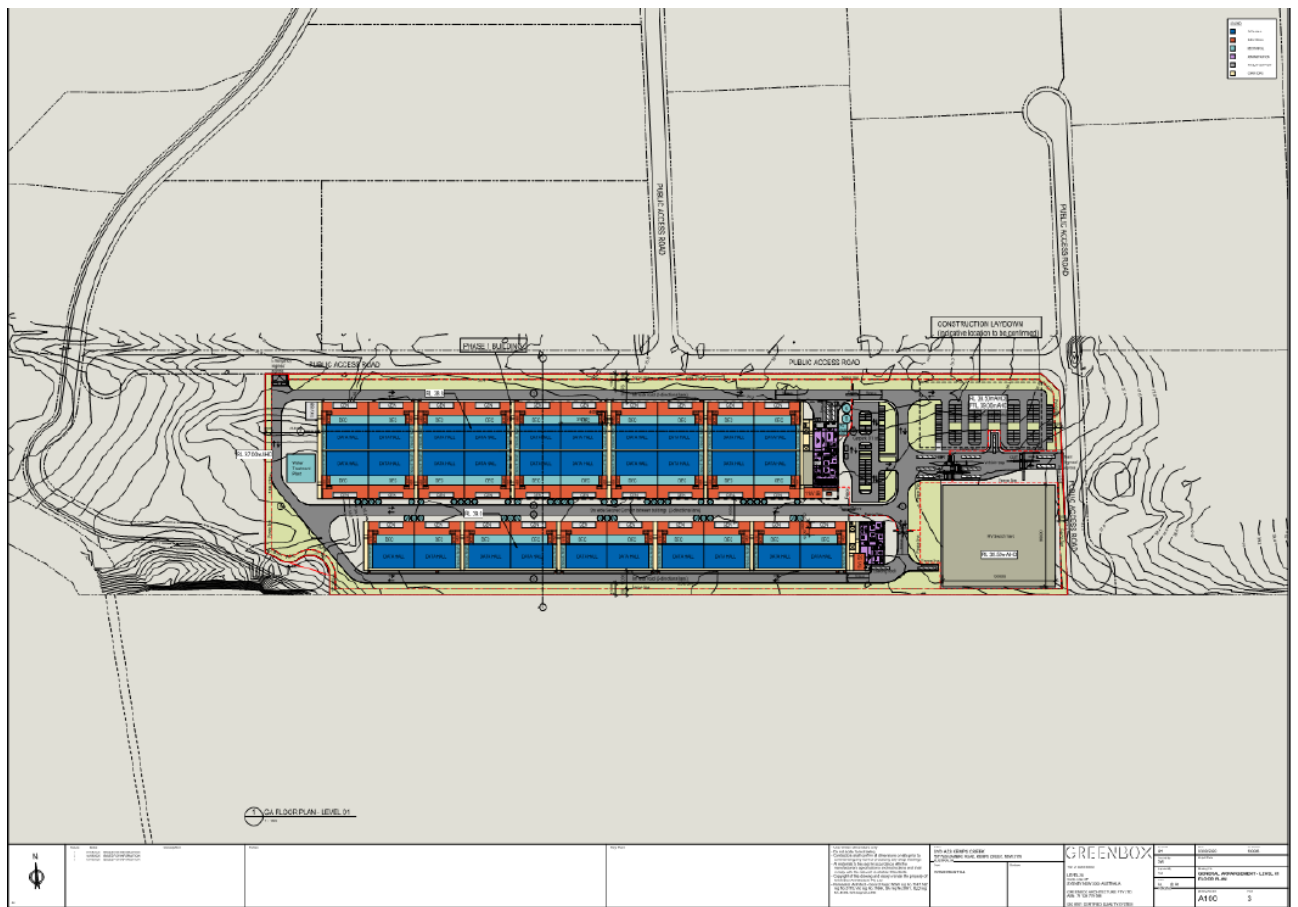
Proposed Site Layout Plan (Source: Greenbox, 2020)
